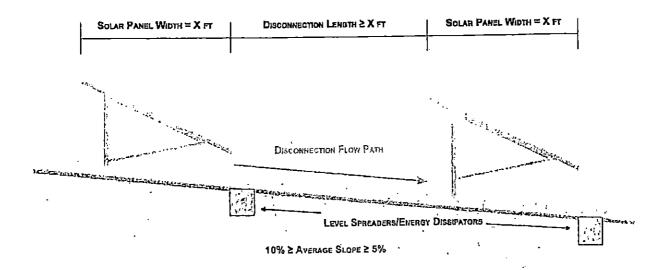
Typical Installation - Slope ≥ 5% but ≤ 10%
